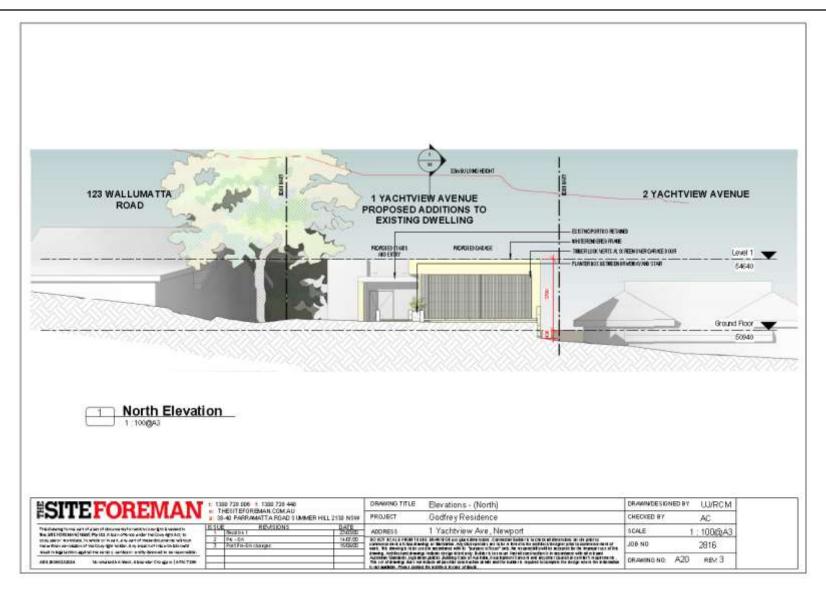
Above & previous pages illustrate the concept, ground floor plan, elevations & 3D image of the as proposed works.
